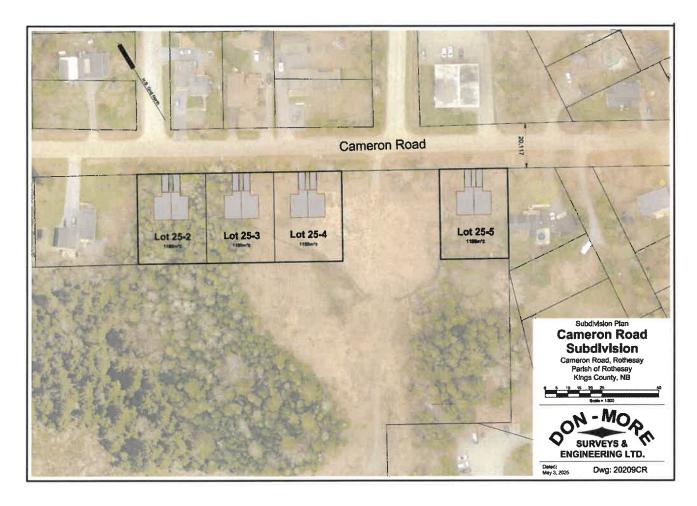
Portion of site to be developed with two-unit dwellings fronting on Cameron Road.
